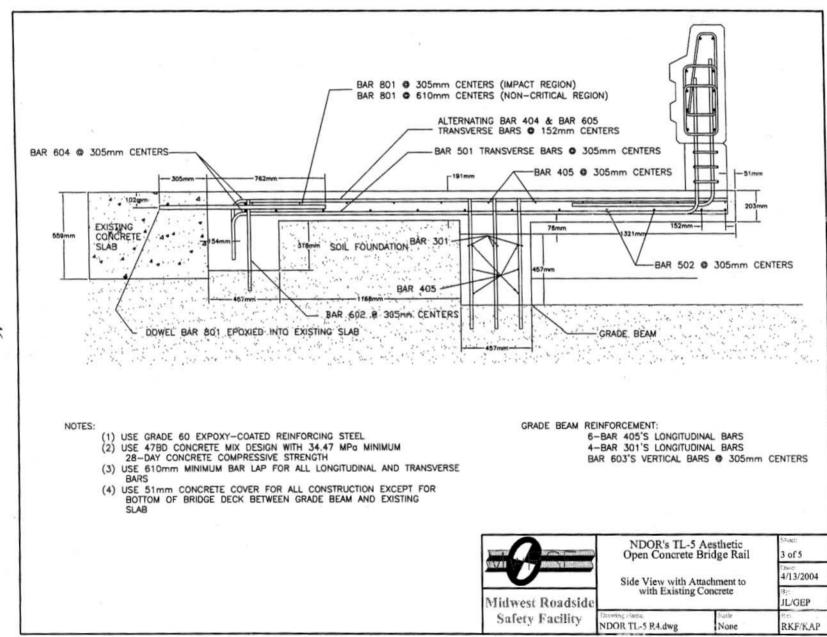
NDOR's TL-5 Aesthetic Open Concrete Bridge Rail Attachment to Existing Concrete Design Details
